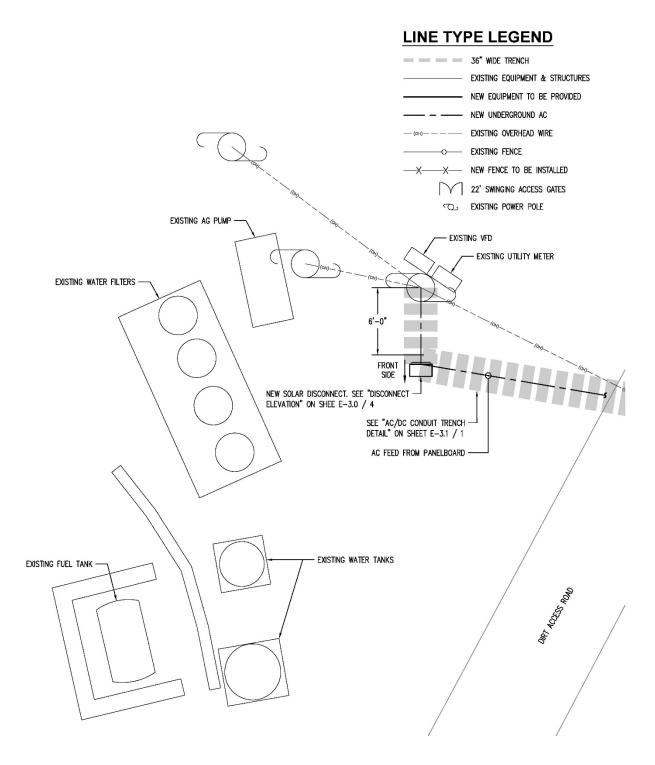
Site Plan – Proposal for the point of interconnection from the solar array to the existing well pump used to support agricultural activities. (Source: IX.1)
